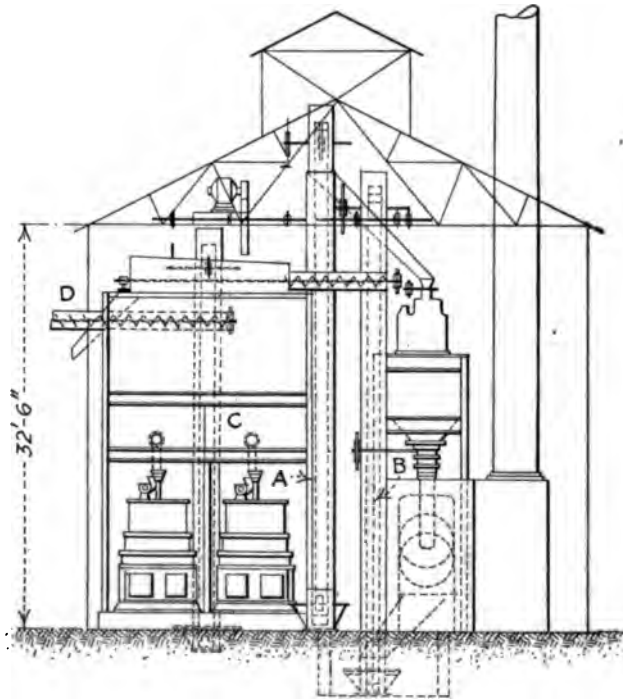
40-FT. BY 60-FT. COAL MILL, DRYER AND MILL ELEVATION
